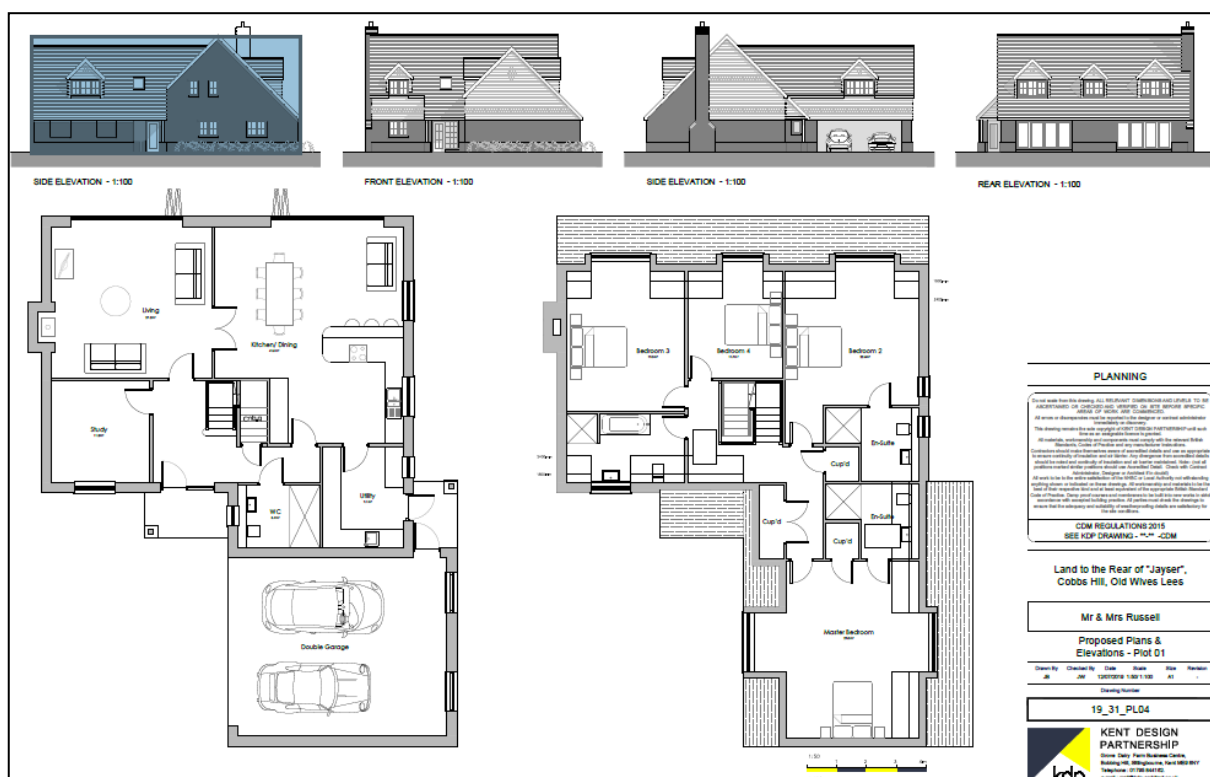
Refused elevations and floor plans – 19/01342/AS
